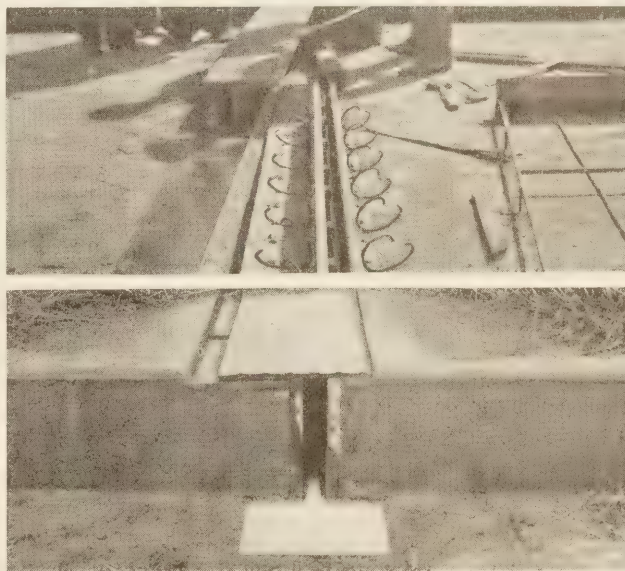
TYPE I JOINT BEING PLACED IN POSITION ON THE SUBGRADE (UPPER), AND APPEARANCE OF JOINT AFTER CONSTRUCTION OF PAVEMENT SLABS (LOWER).
